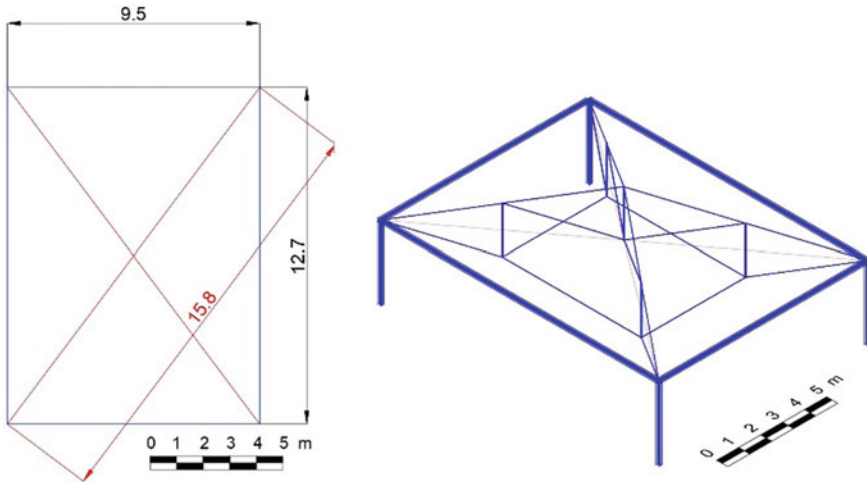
Axonometric view and plan of the proposed model for the tensile-greenhouse
